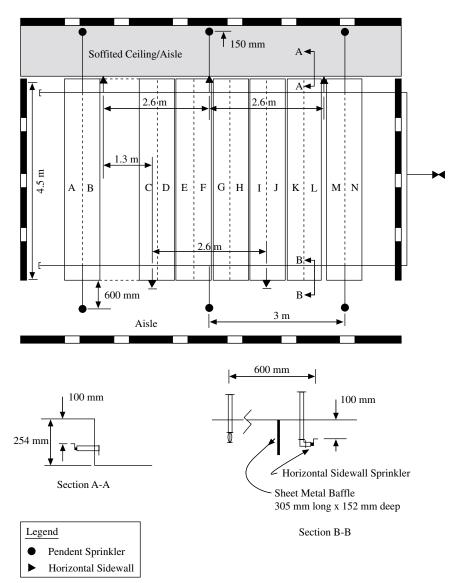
Horizontal sidewall and pendent sprinkler layout.
